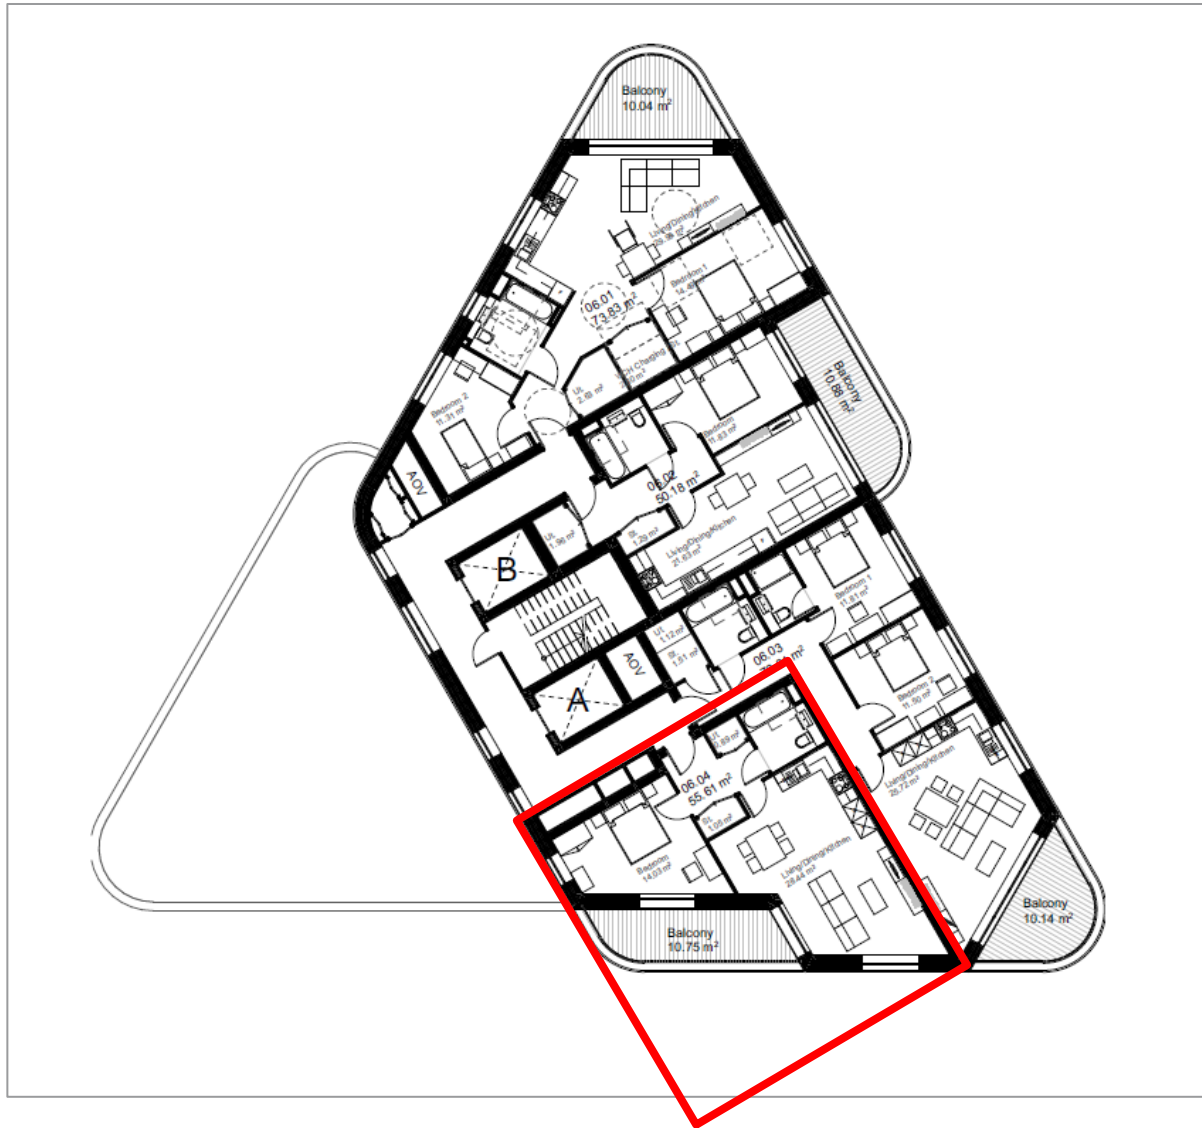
6th floor plan, B.06.04 mid-floor dual-aspect south facing 1bed apartment (Source: Stock Wool Architecture 17.12.2020).
